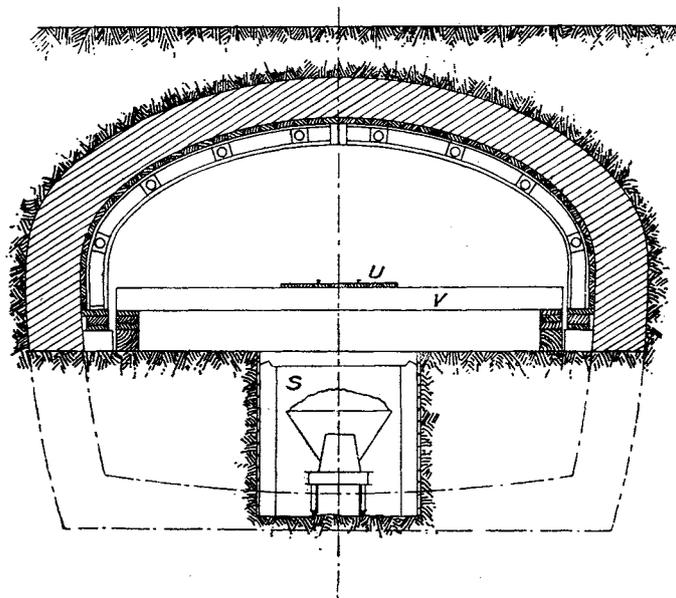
METROPOLITAN RAILWAY, PARIS.
